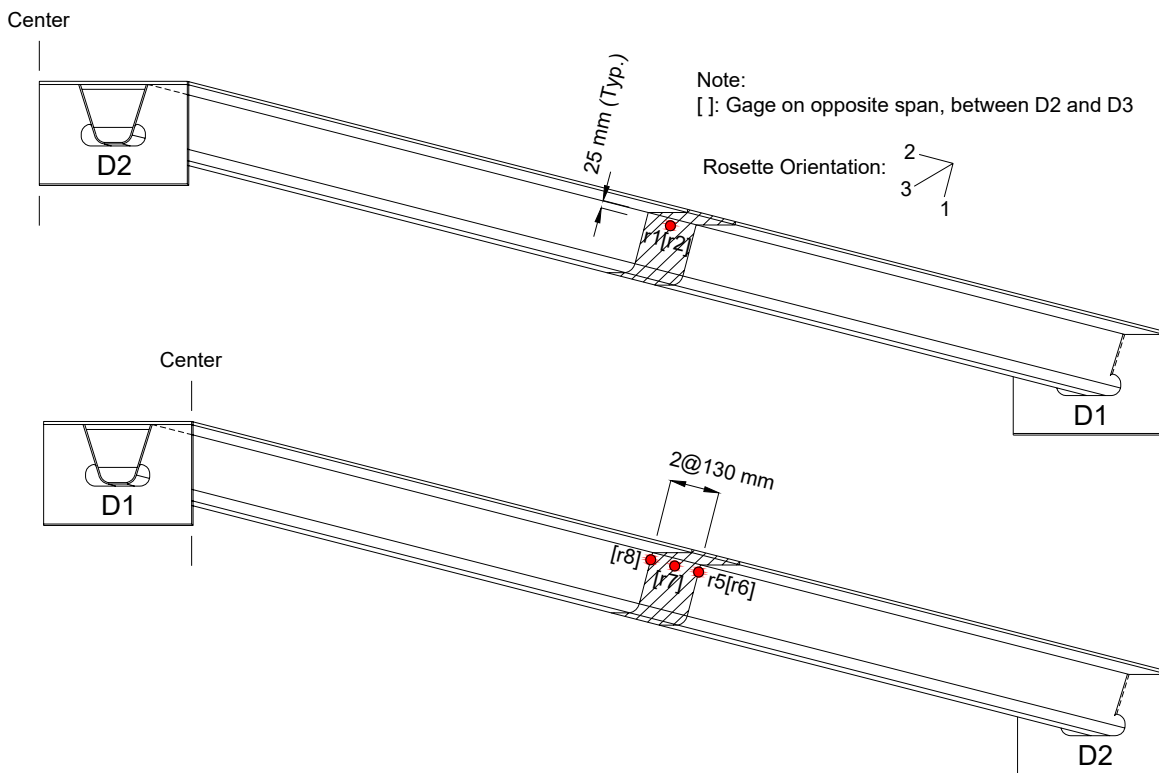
Specimen 3: Strain Gages in Outer Surface of Rib R2 near Rib-to-Deck Welds
